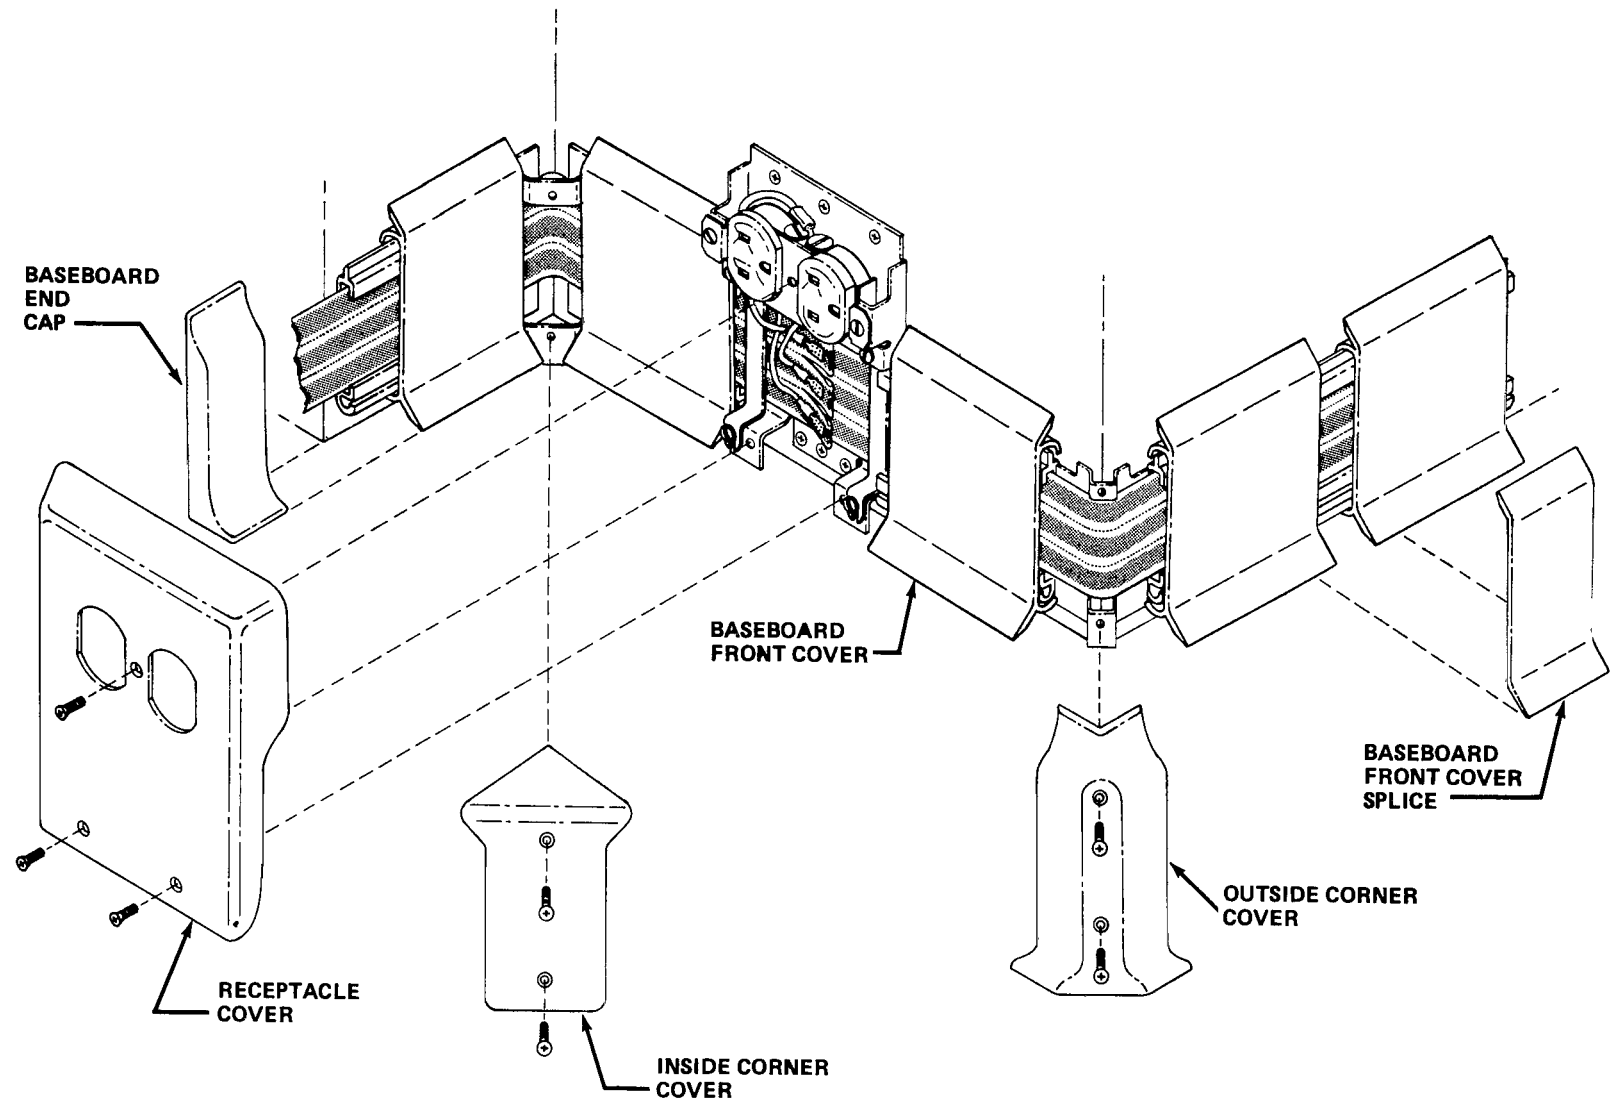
Baseboard assembly with cable, receptacle, and front cover mounted and assembled.
